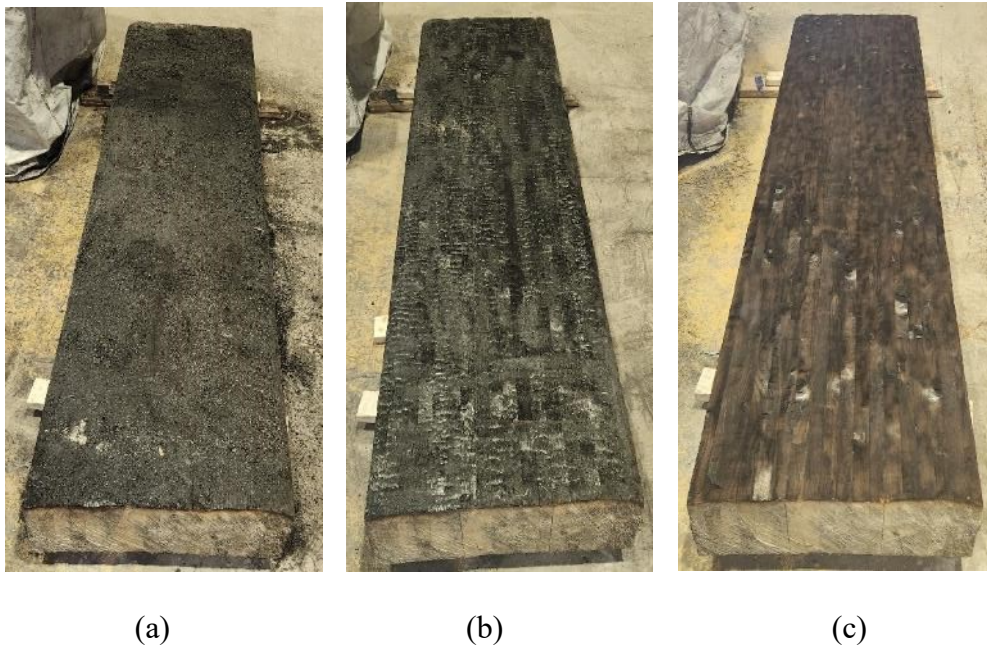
Specimen condition: (a) prior to char removal (b) dust removal (c) after char removal using wire wheel brush
